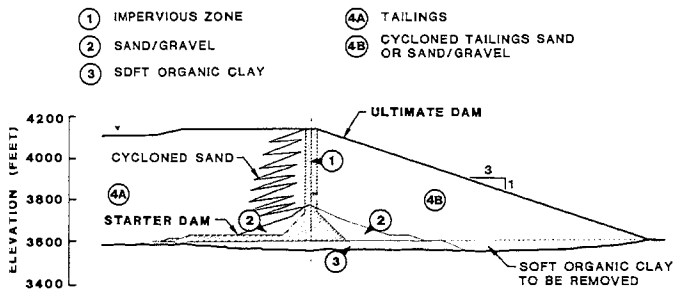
TYPICAL SECTION THROUGH ULTIMATE LORNEX L-L TAILINGS DAM
